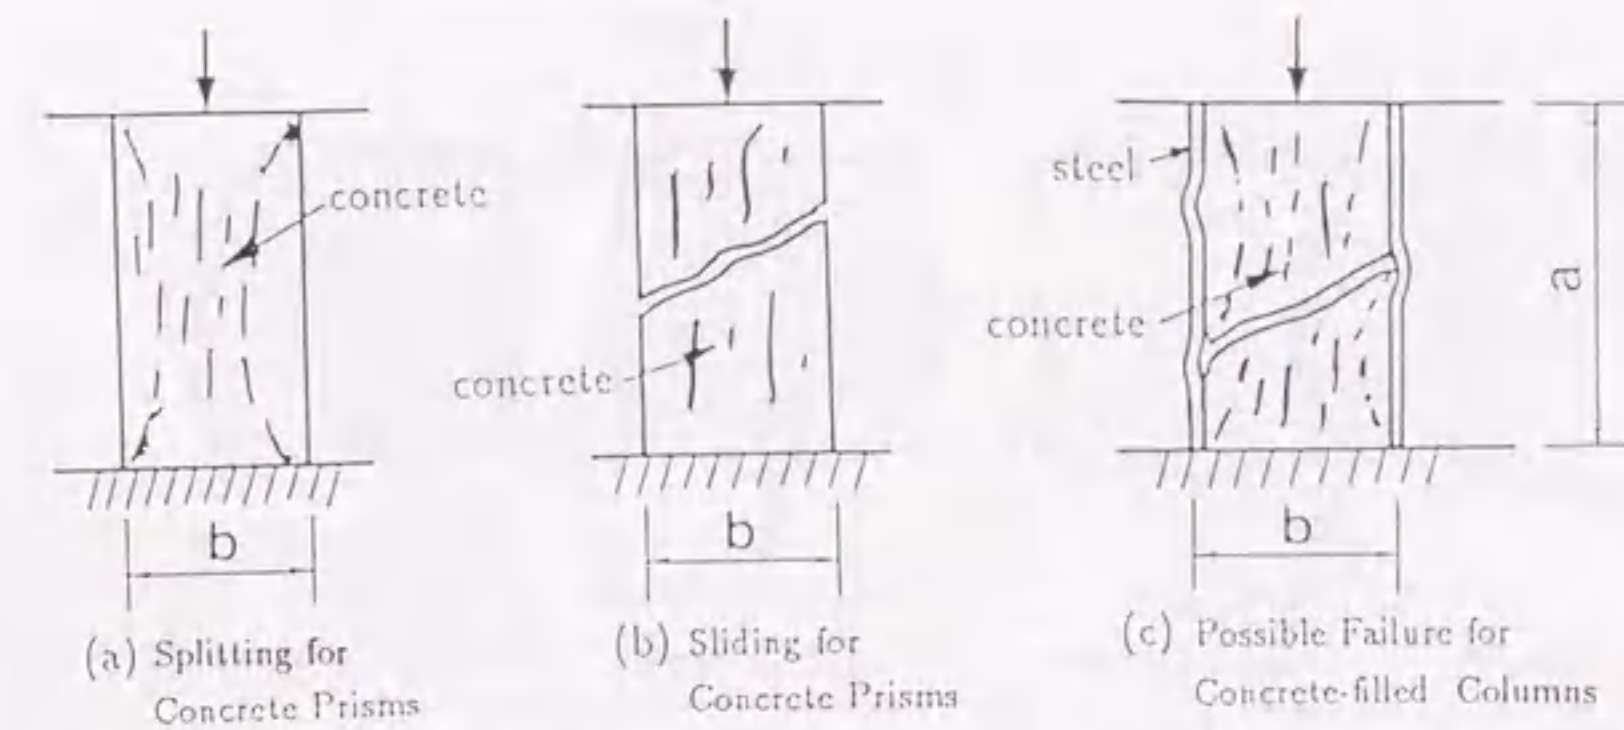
Failure Patterns for Concrete Prisms and Concrete-Filled Columns: (a) Splitting for Concrete Prisms; (b) Sliding for Concrete Prisms; (c) Possible Failure for Concrete-Filled Columns
